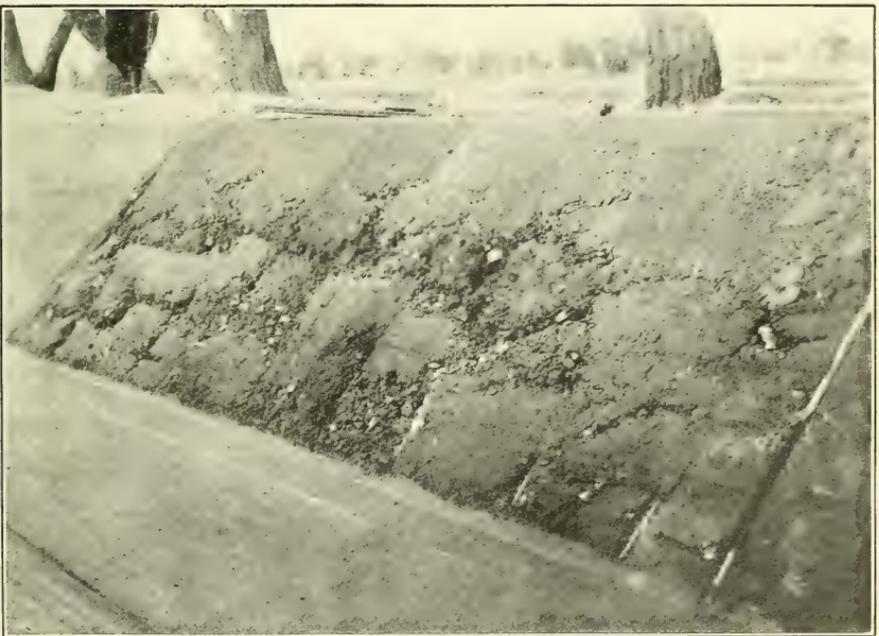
SHOWING EXPANSION JOINT STRIPS EMBEDDED IN CONCRETE LINING AND APPEARANCE OF CONCRETE SURFACE BEFORE APPLYING WASH COAT OF NEAT CEMENT MORTAR, TUCSON FARMS CO., TUCSON, ARIZ.
